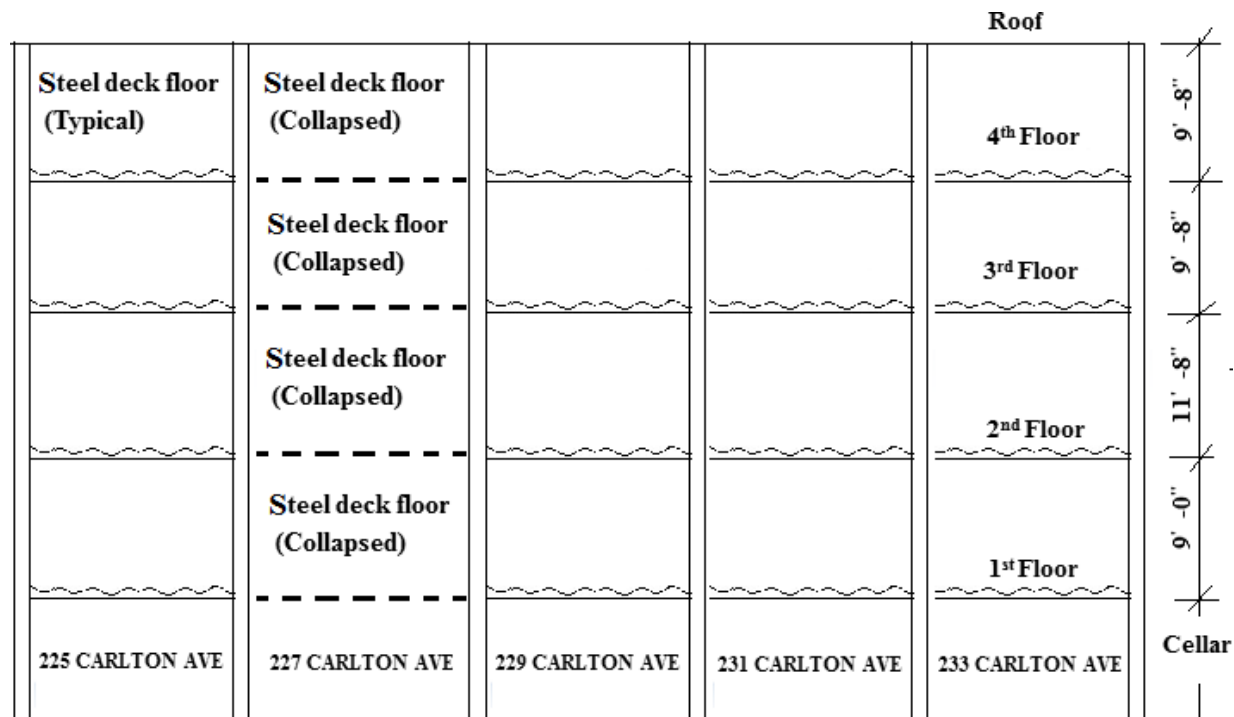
Vertical section x-x of the building after the floors collapsed.
